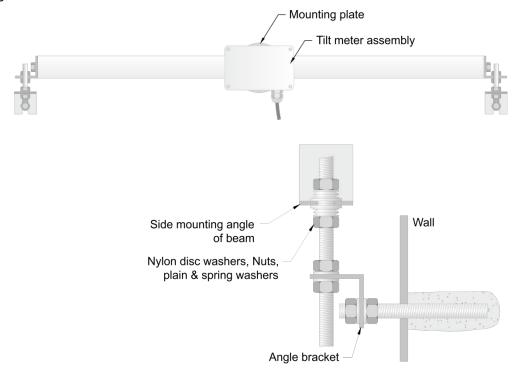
Installation of the EAN-91M-B sensor horizontally on the wall
